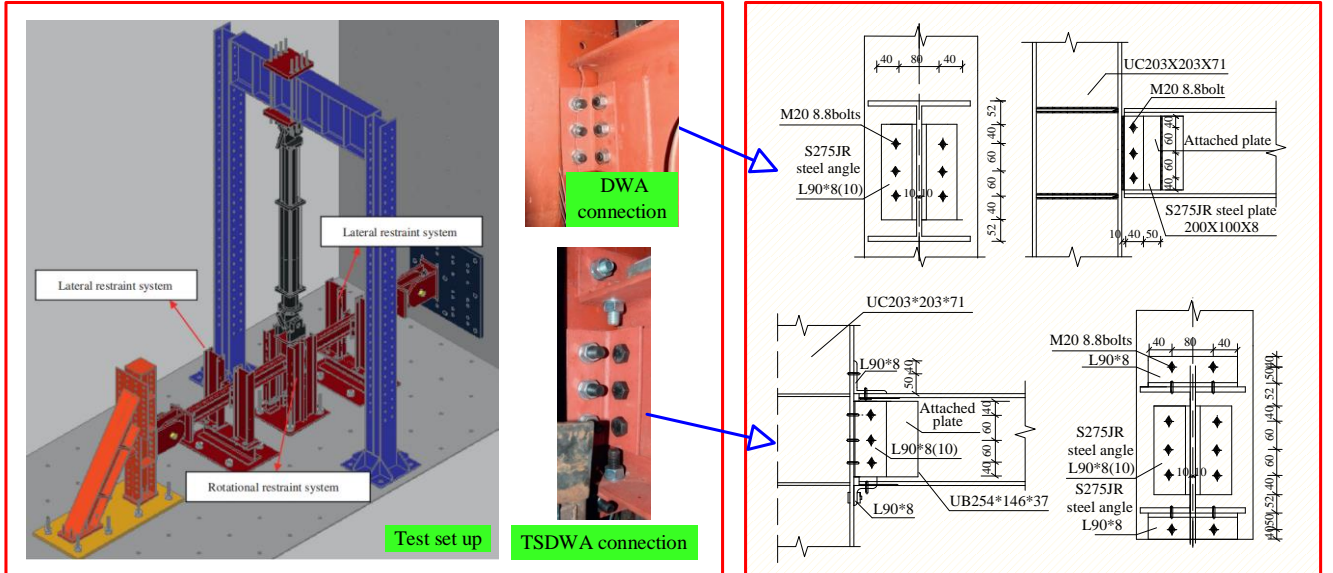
Collapse tests of beam–column assemblies with DWA and TSDWA connections [15] (dimension units: mm)
